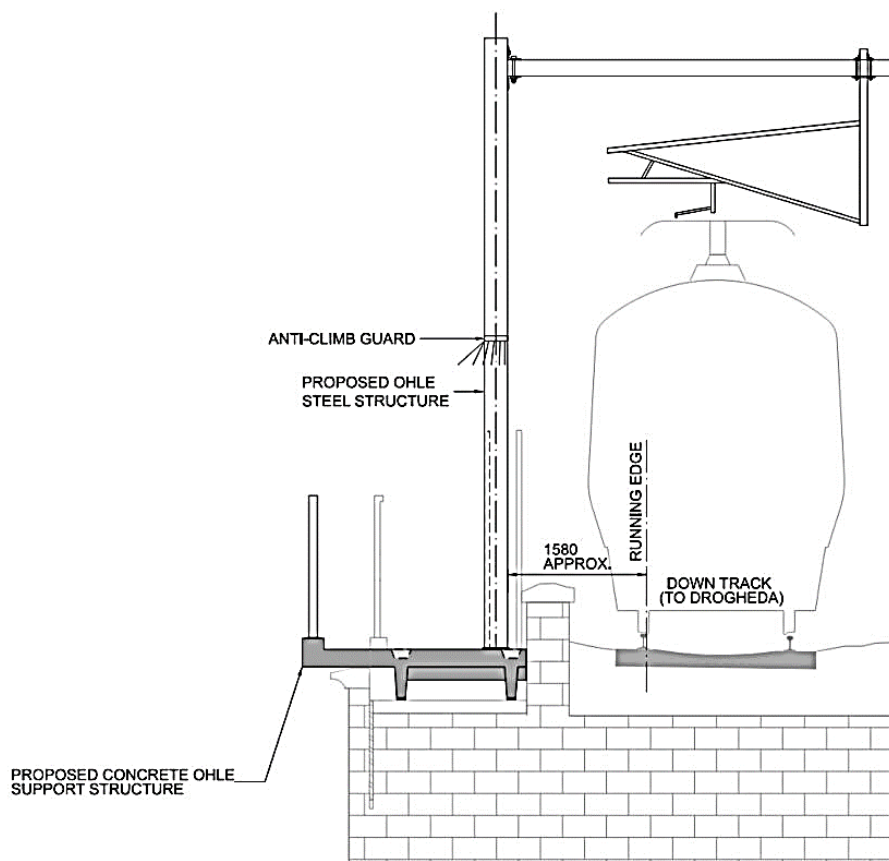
Walkway and OHLE detail on Balbriggan Viaduct
